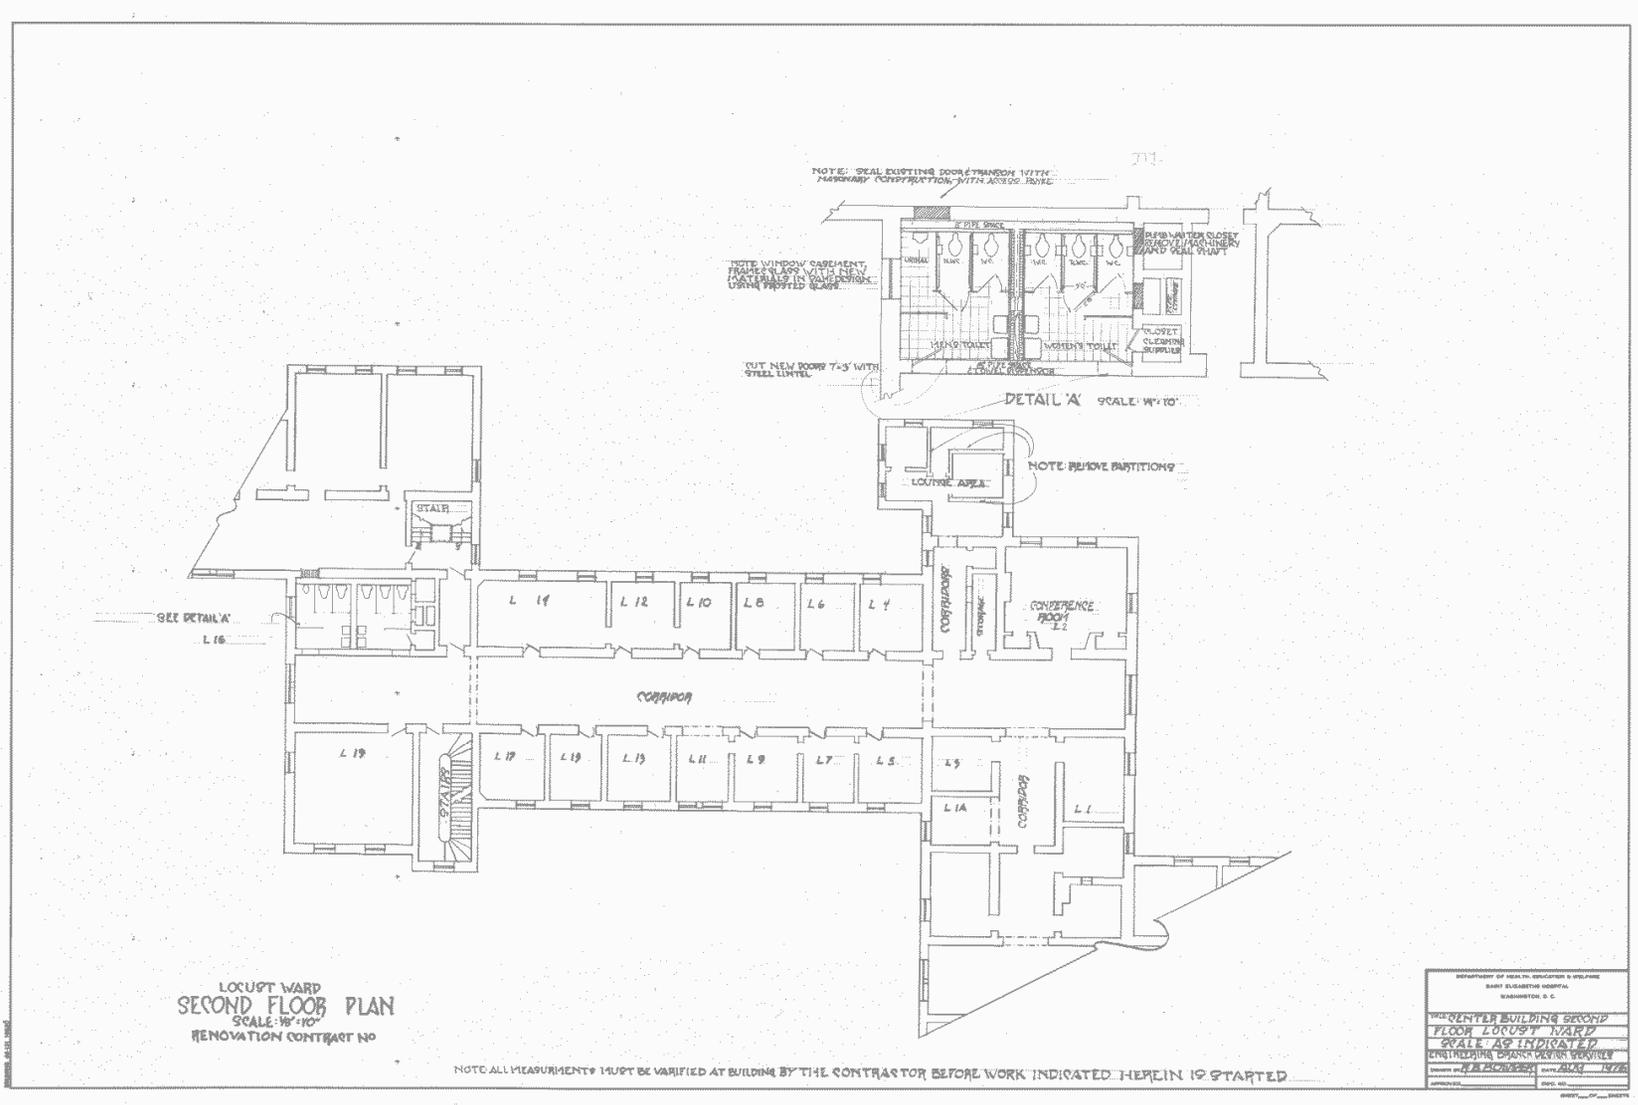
Second floor plan of East Wing outlining bathroom addition, 1976. Source: GSA archives, image DC0080SE0108.
